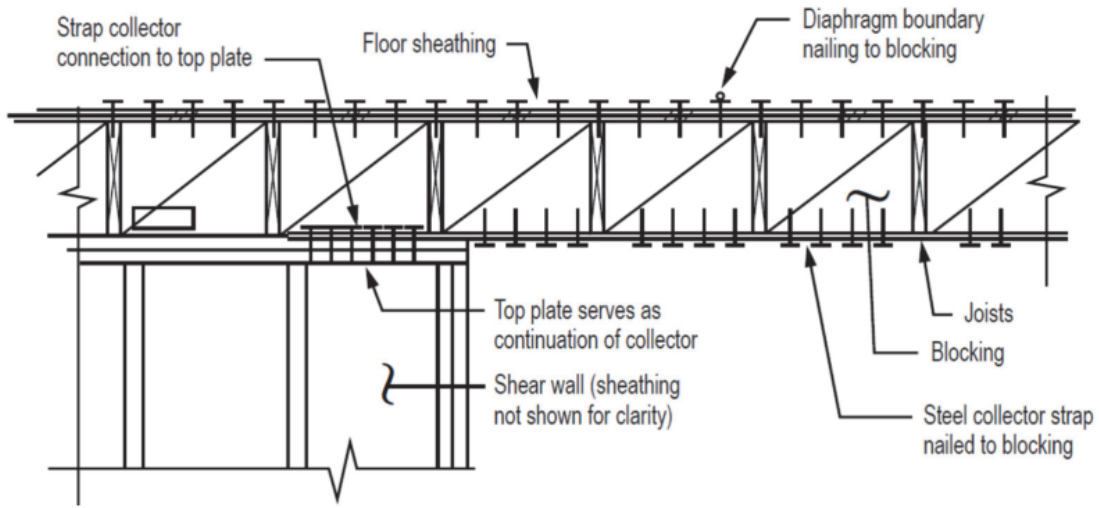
Use of blocking and steel straps to transfer tensile forces in the structure (from
